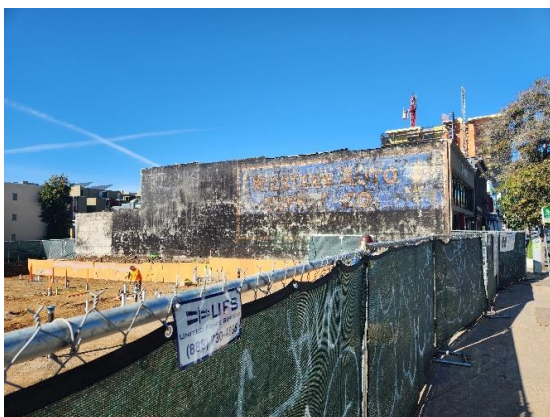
View of south façade of subject building, showing previously obscured former tenant signage. Looking northwest.
